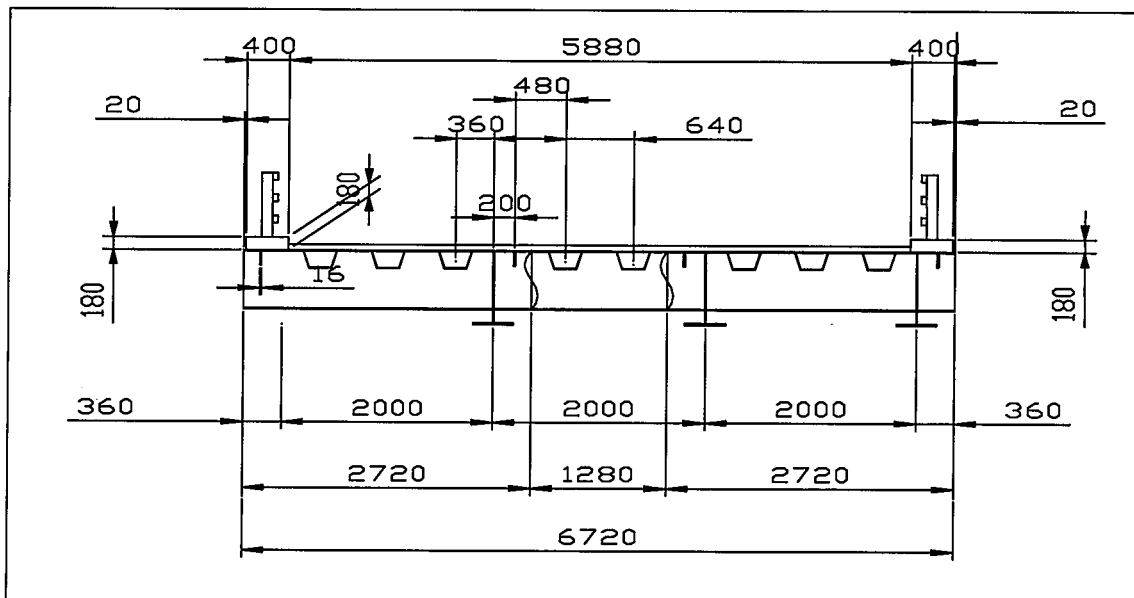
Main Dimensions of Steel Plate Deck under Construction
